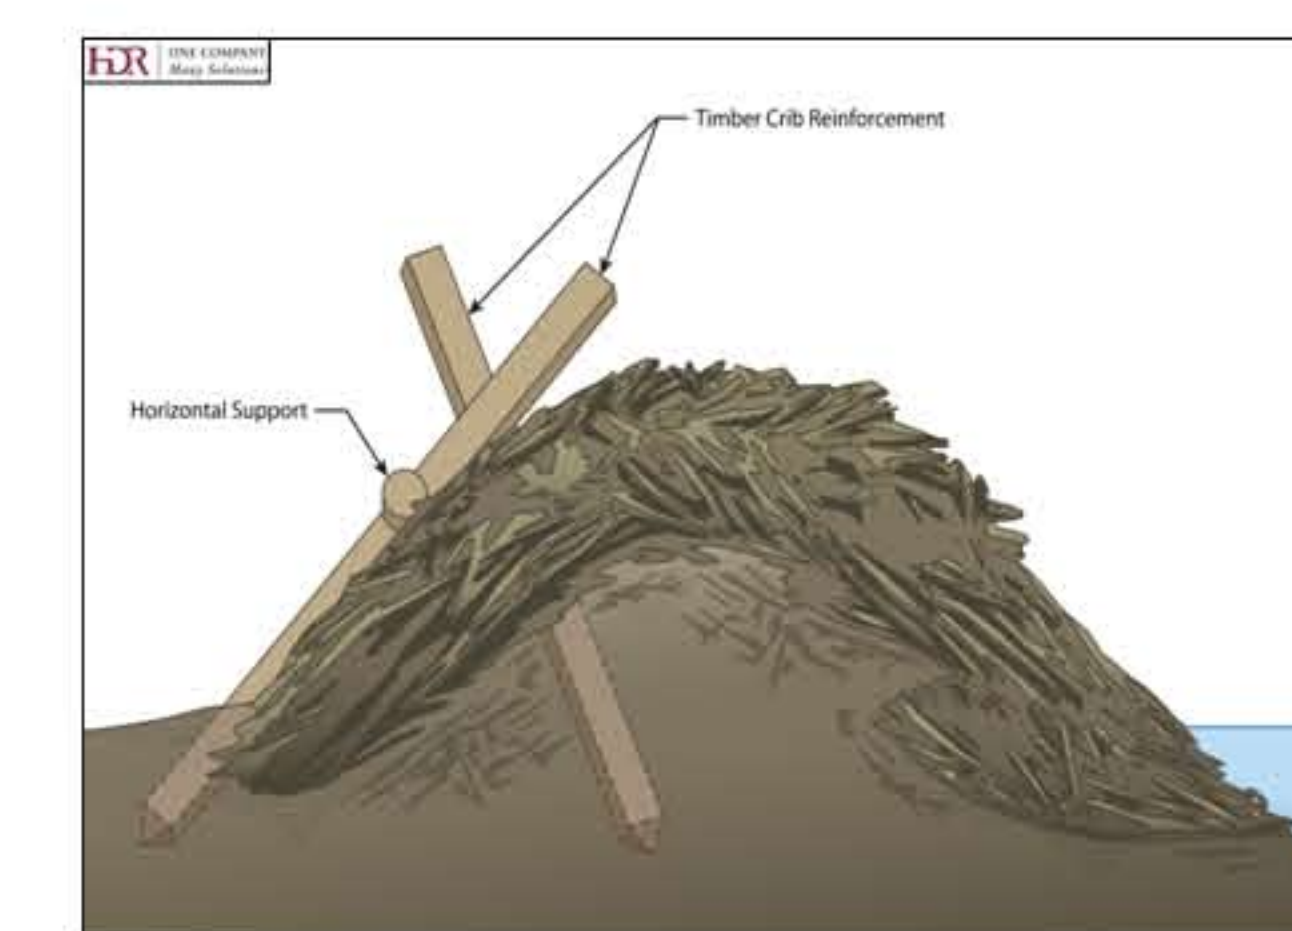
Site 4 Wetland Remnant Beaver Dam Conceptual Stabilization.
